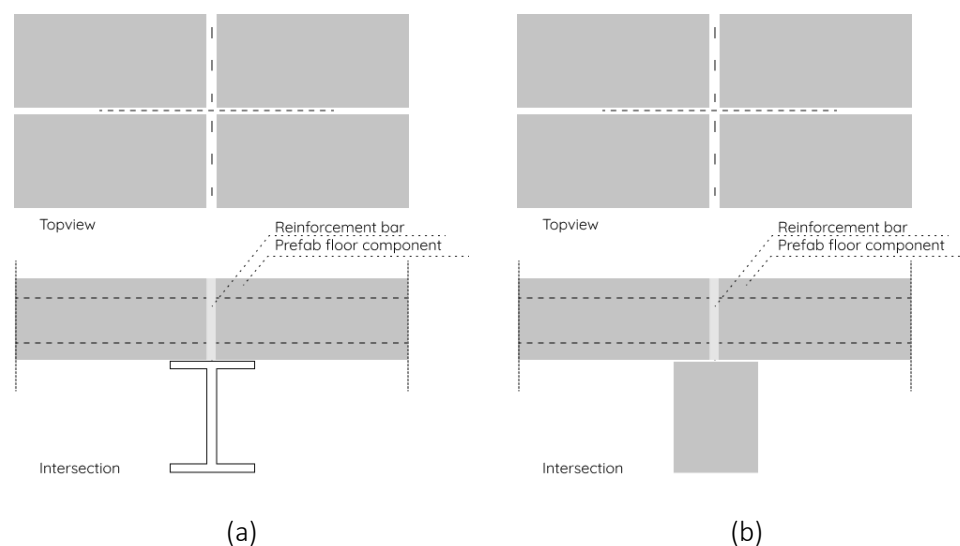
A) steel beam – prefab floor component. B) prefab beam – prefab floor component.
